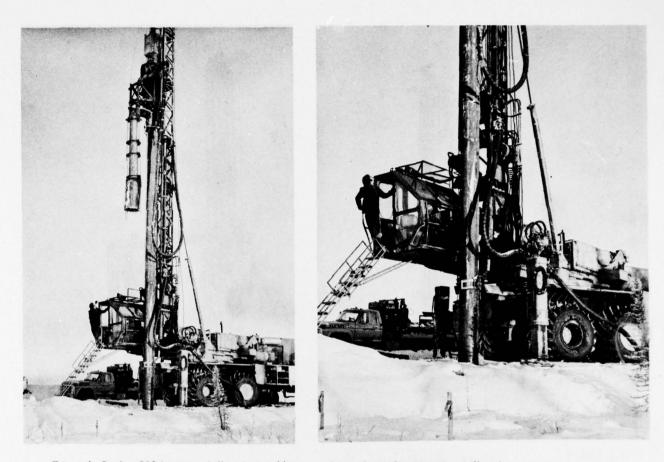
Becker 520 hammer drill with diesel hammer drive. A purely percussive drill with no rotary component.
